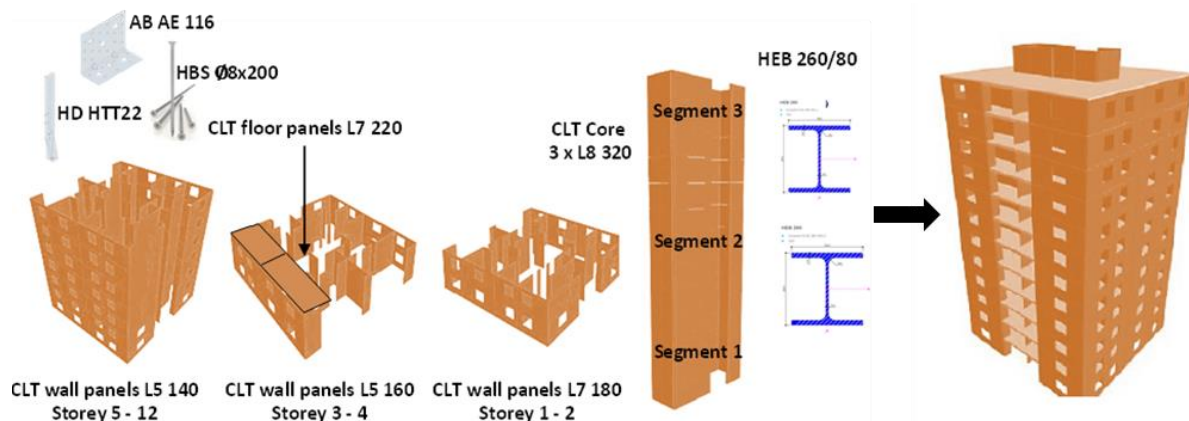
Final sizes of structural elements, CLT wall and floor panels type, CLT core segments and connection types considered for the design & seismic analysis of the case study building.
